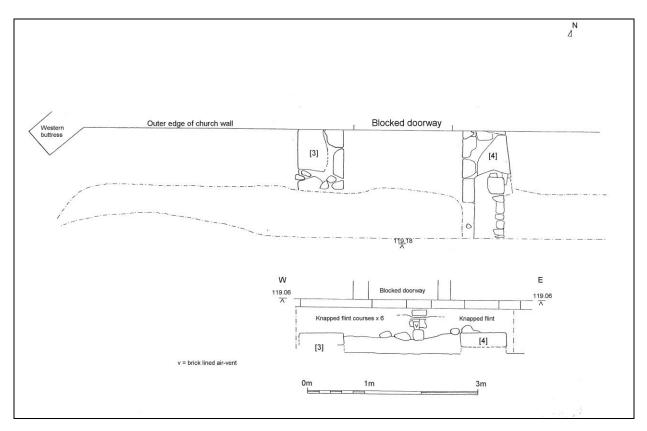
Plan and section through the blocked southern porch (*Scale as shown*)
